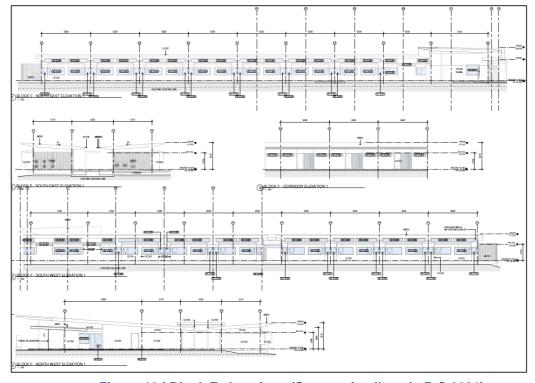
| Block F elevations (Source: Applicant's RtS 2021)
